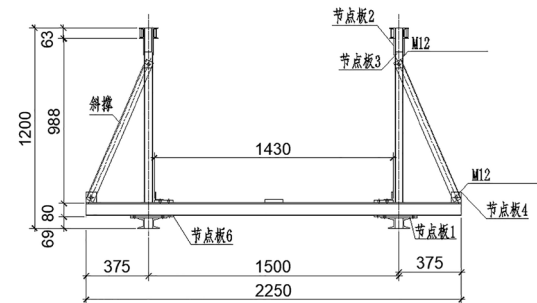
Sectional view of assembled diagonal bracing on the bridge (unit: mm)
